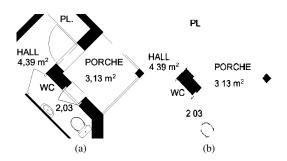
Detail of a floor plan (a) and the text extraction result if no wall segmentation was performed.
